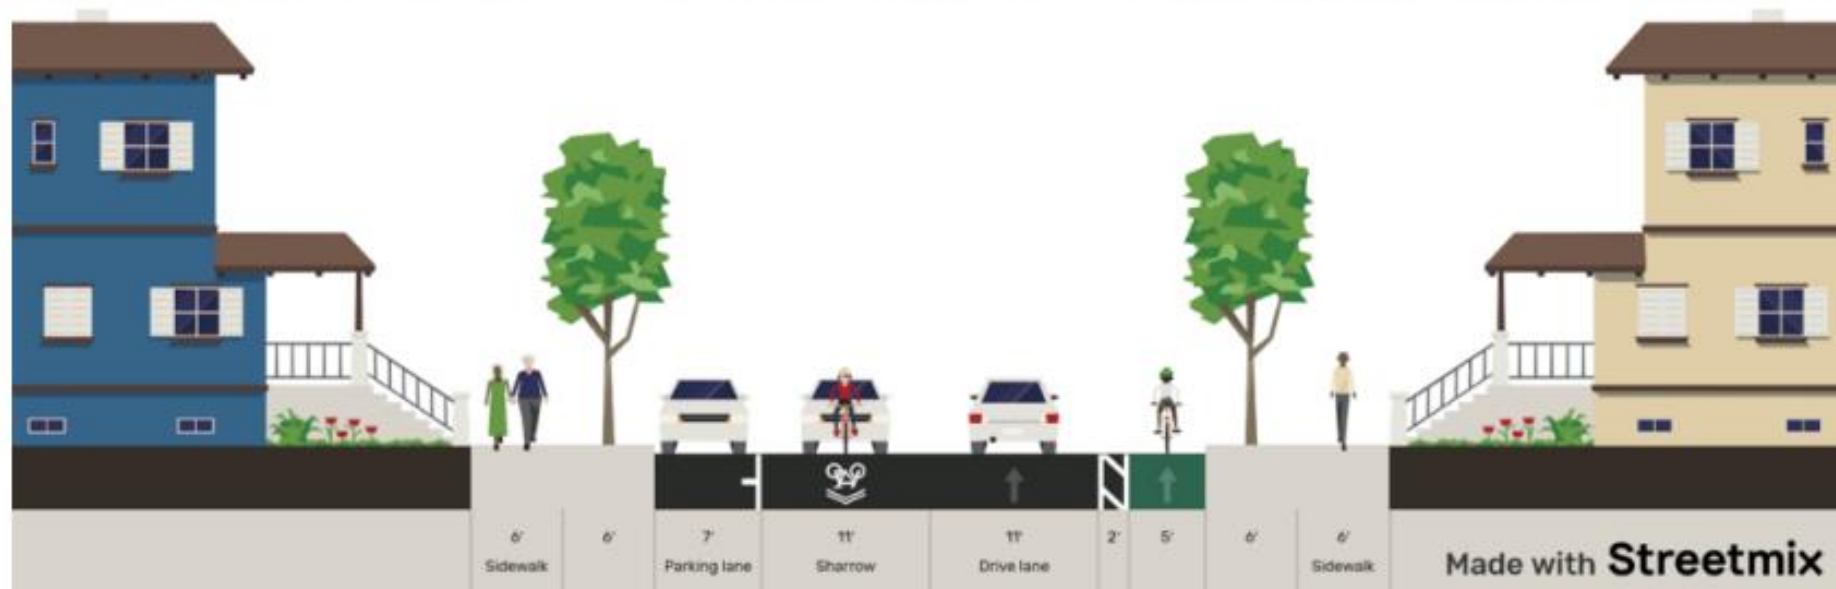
Proposed Cross Section on Centre Avenue from Bigelow Boulevard to Allequippa Street
